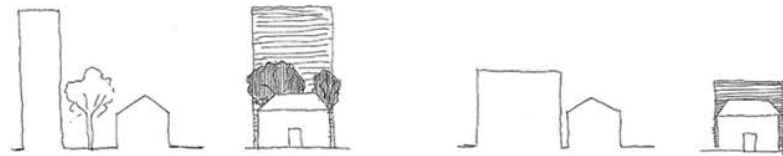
A building of greater height but which preserves a more appropriate setting to a house (left) is preferable to a building of greater bulk that reduces the setting (right).
